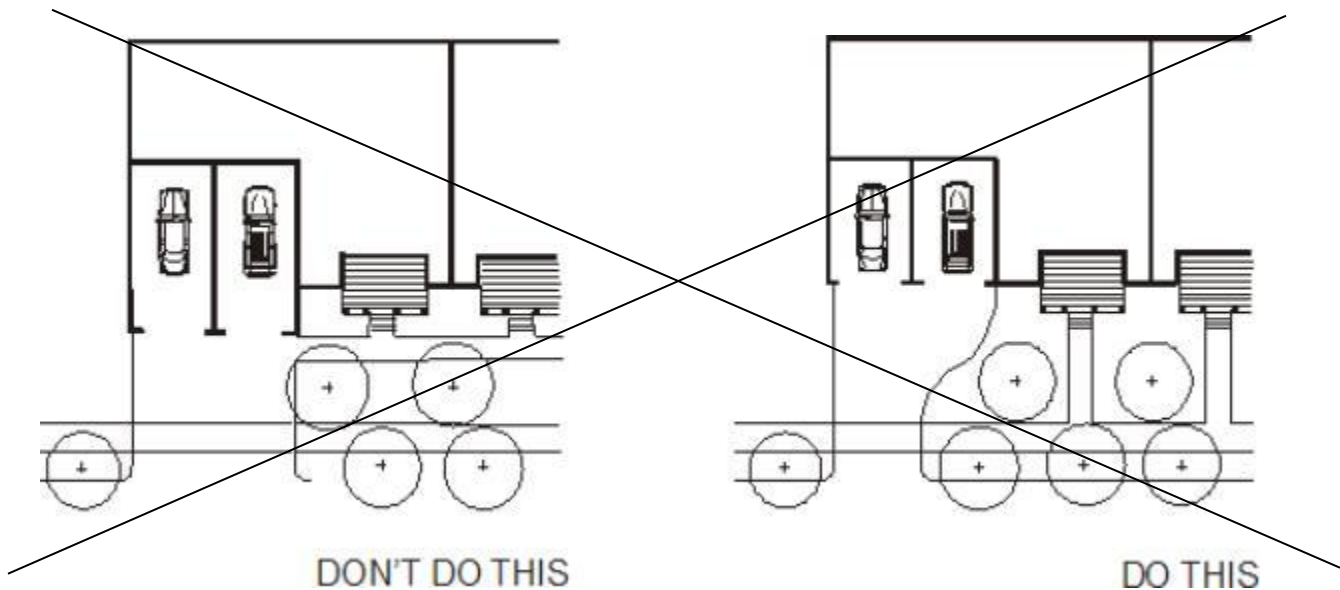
(E): Examples of breaking up parking and siting it behind buildings. Such development creates an attractive open space and avoids the impact of a large central parking lot.
